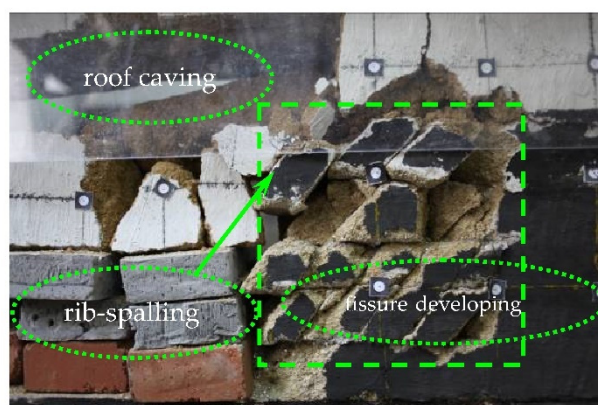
Development of joint and instability form the coal wall rib-spalling ($\alpha = 60^\circ$).
